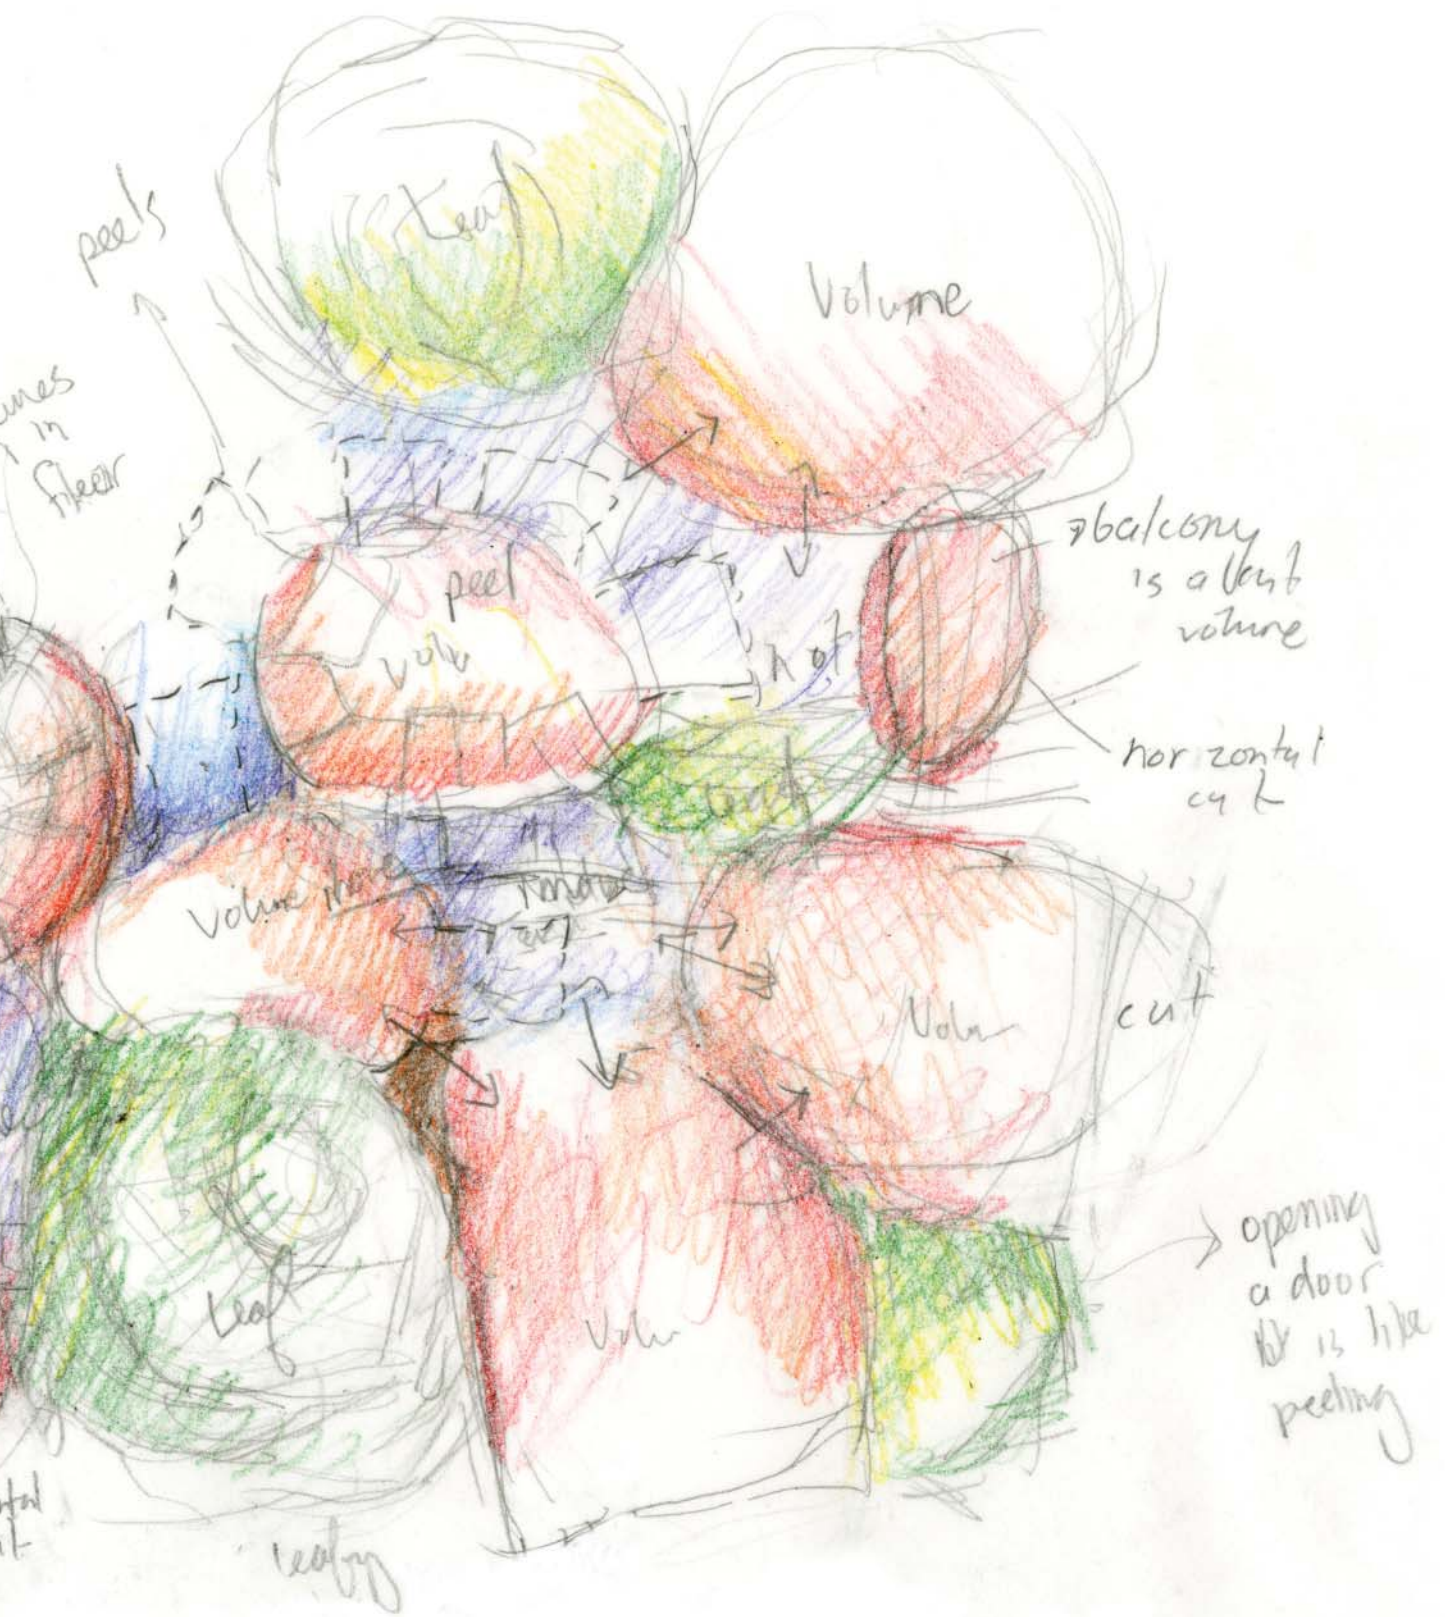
Concept sketch of first floor plan at approximately 1:75 scale
